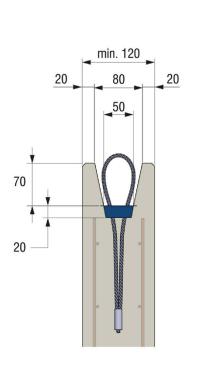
Wall - Wall - T-CONNECTION - detail with bended wire loops
